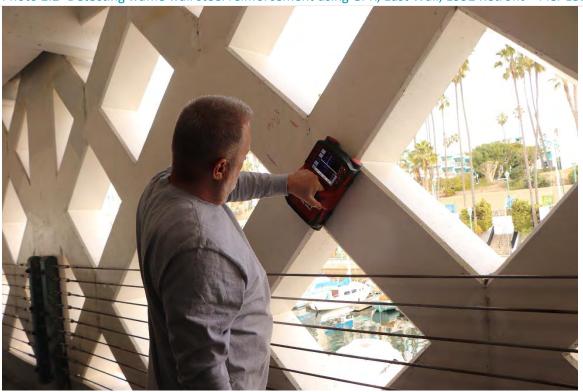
Detecting waffle wall steel reinforcement using GPR, East Wall, 1992 Retrofit – Pier Level (BA2-12)
